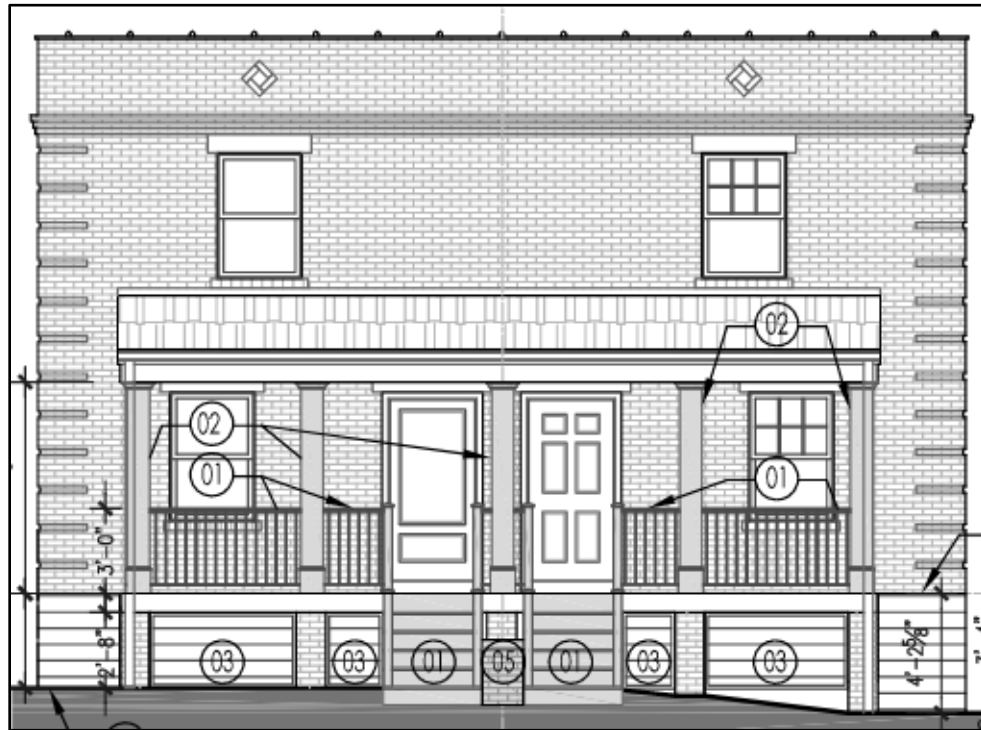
Proposed porch alterations at 1612 & 1614 Princess St.
